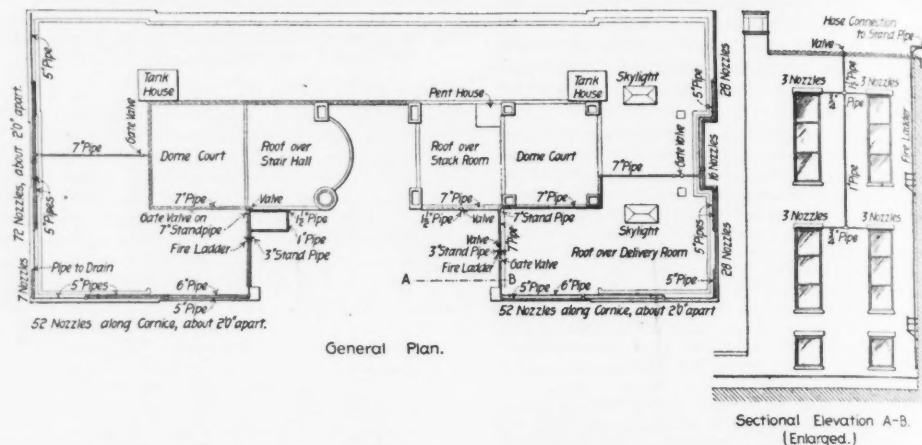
PLAN AND PART ELEVATION OF EXTERNAL FIRE PROTECTION SYSTEM FOR THE CHICAGO PUBLIC LIBRARY.
